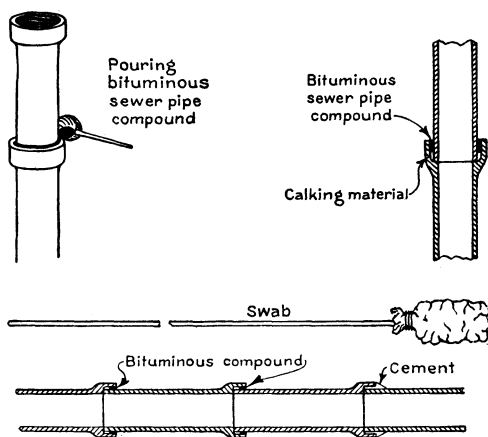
Method of assembling vitrified sewer-pipe unit.
